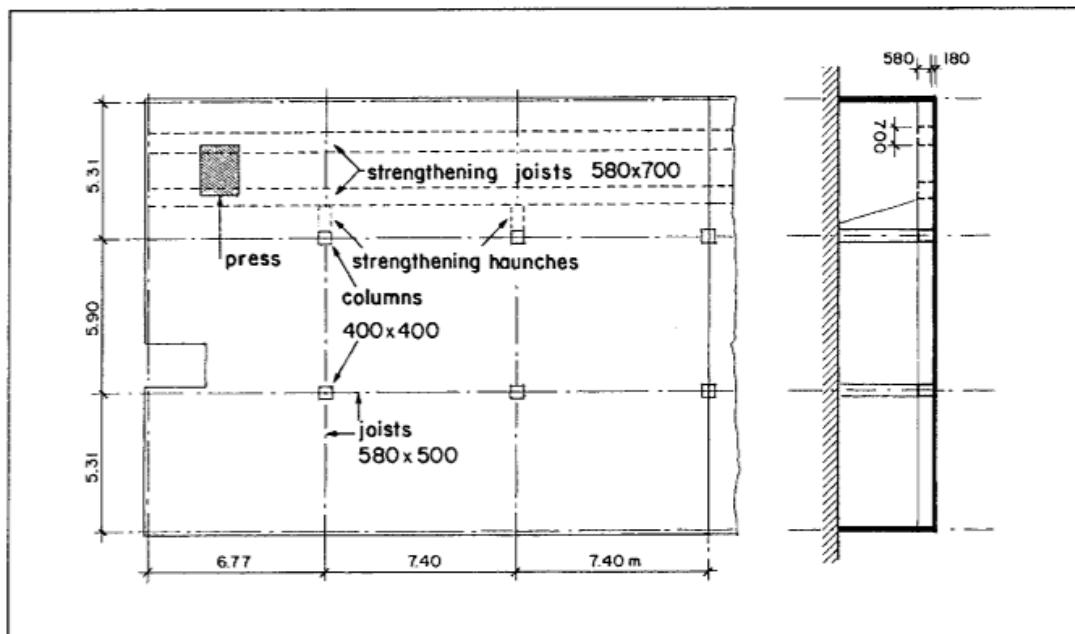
Plan and section of a factory floor with metal-forming press (from [A10.1])
